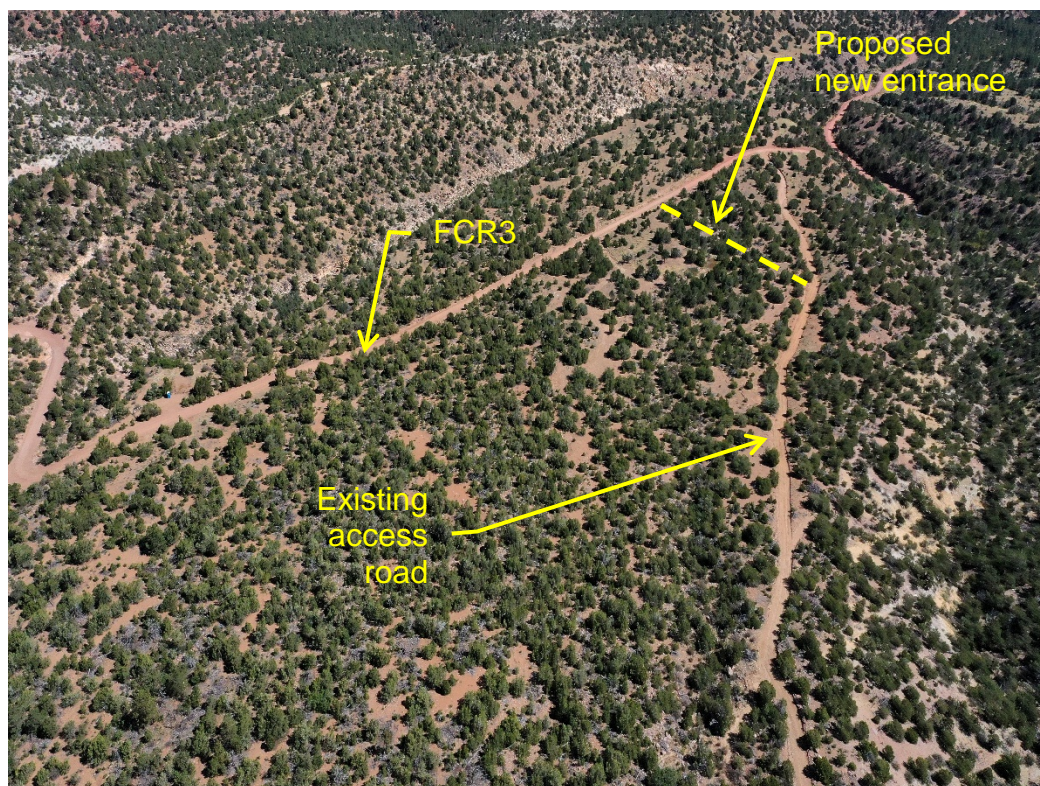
Existing access road from FCR3 and approximate location of proposed new entrance road (looking NE).
